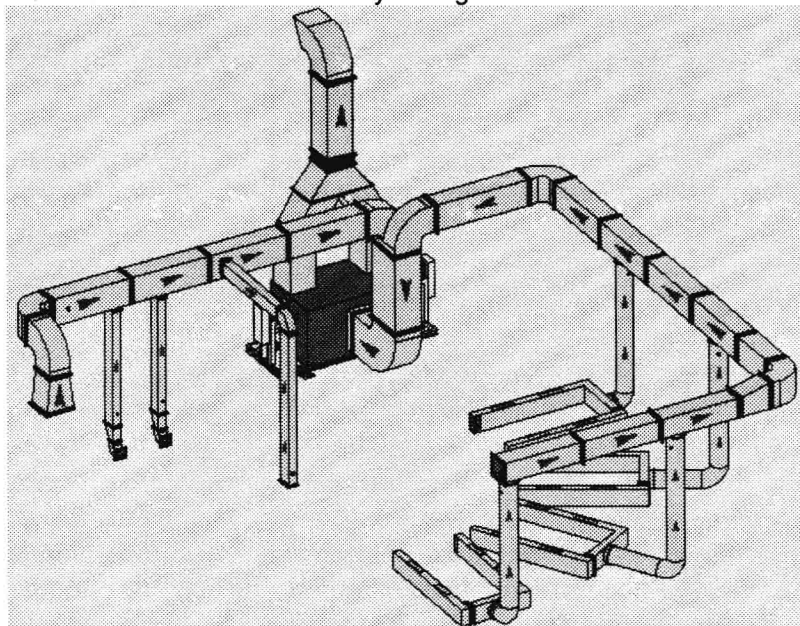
Customer plant: detail of the foaming area's ventilation system.
